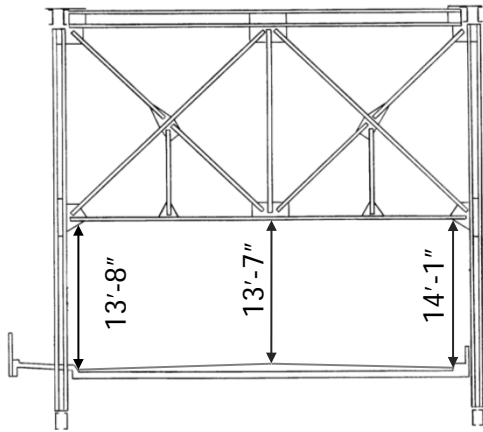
Cross-section view of a through truss bridge showing minimum vertical clearance.
